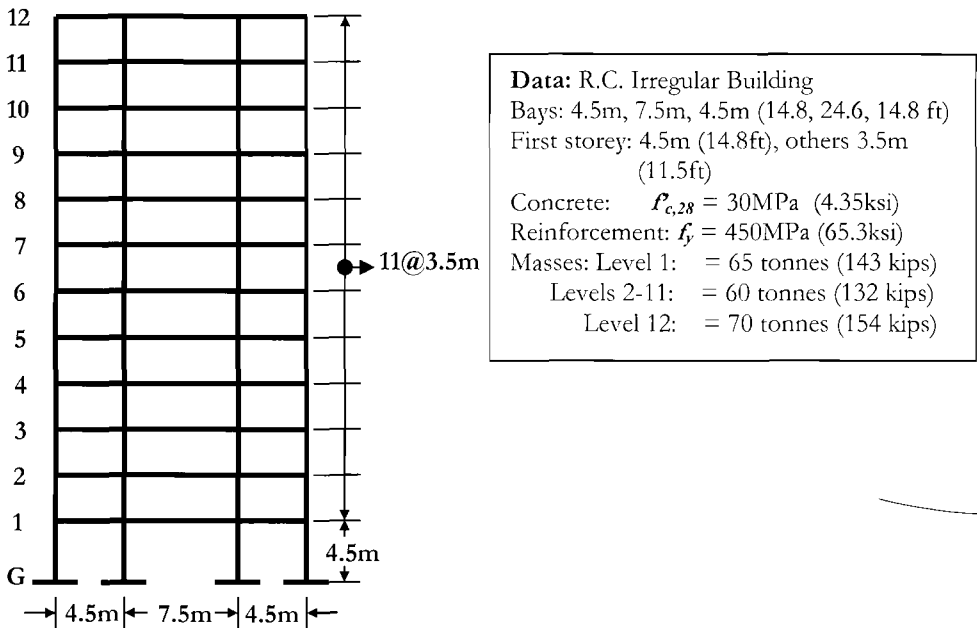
Reinforced Concrete Frame for Design Example 5.1
